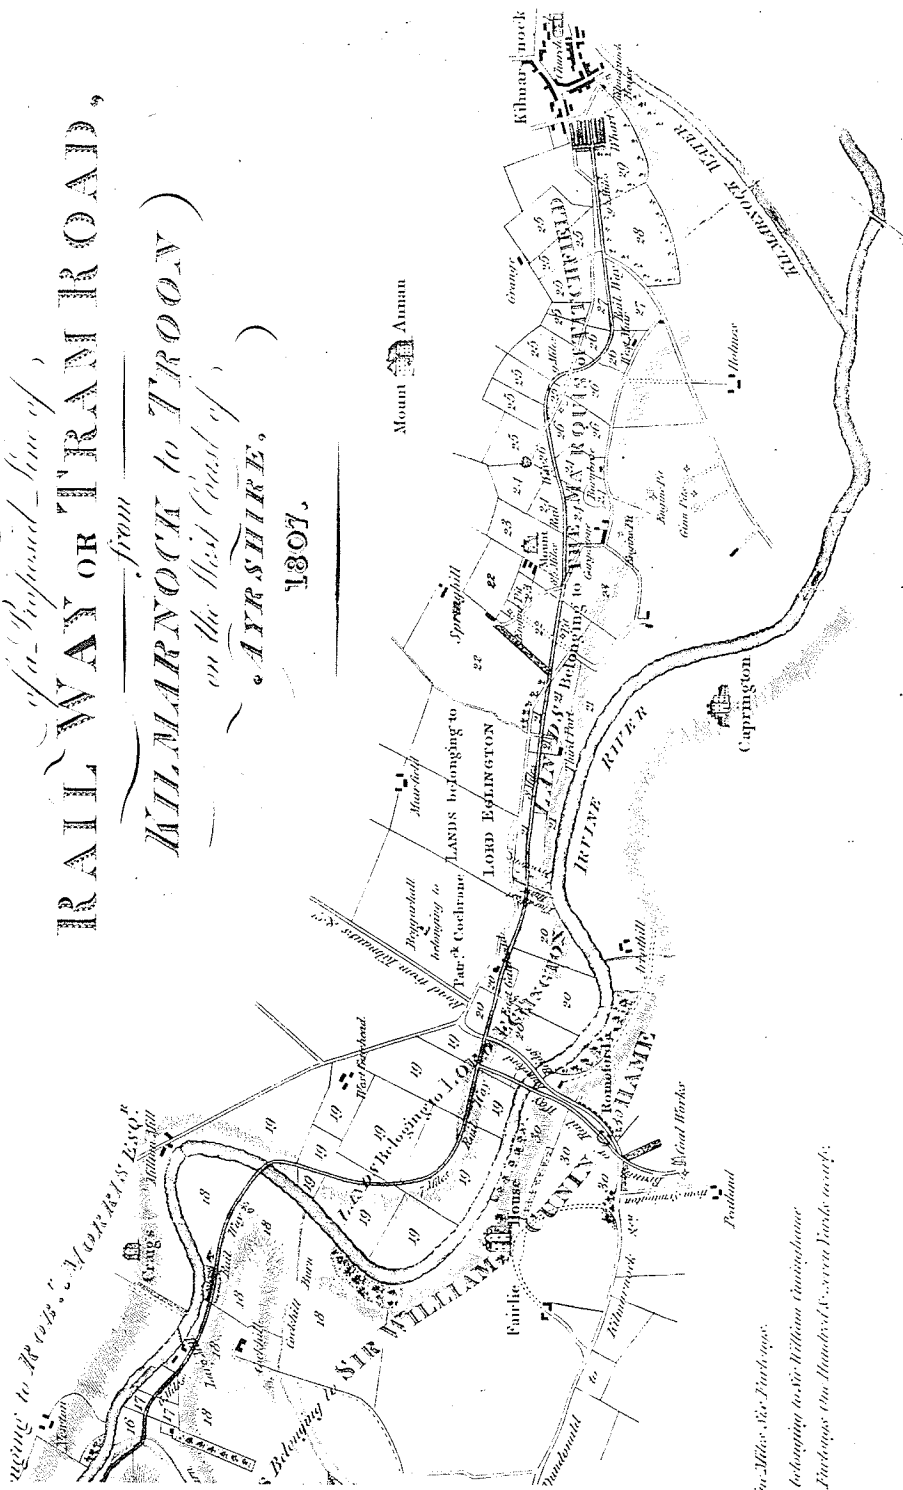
Part of plan of Kilmarnock & Troon Railway, 1867.20
